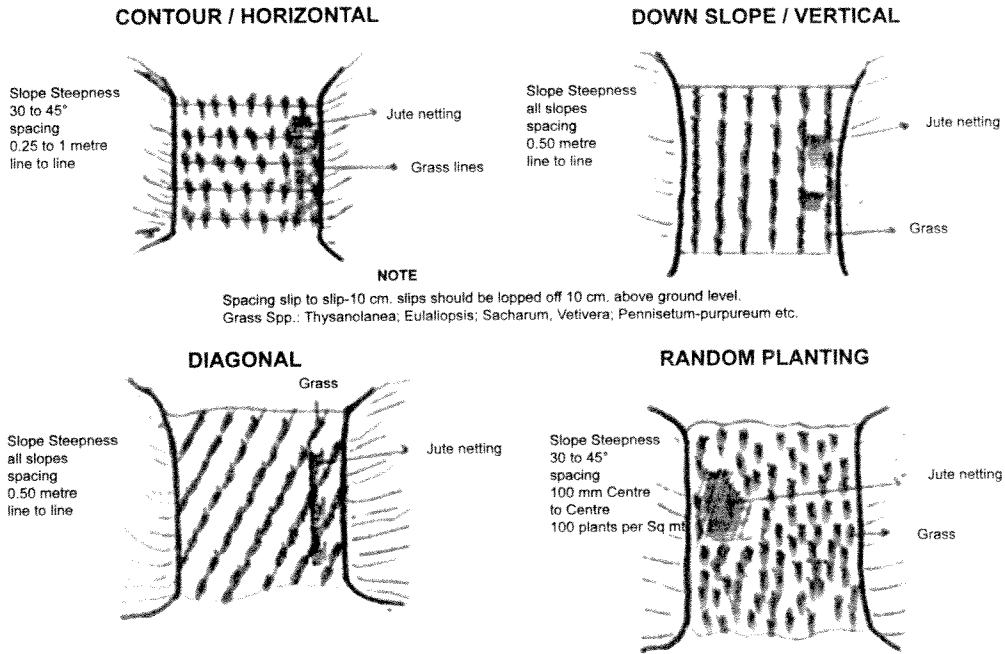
Bio-Engineering Techniques (Grassing)
